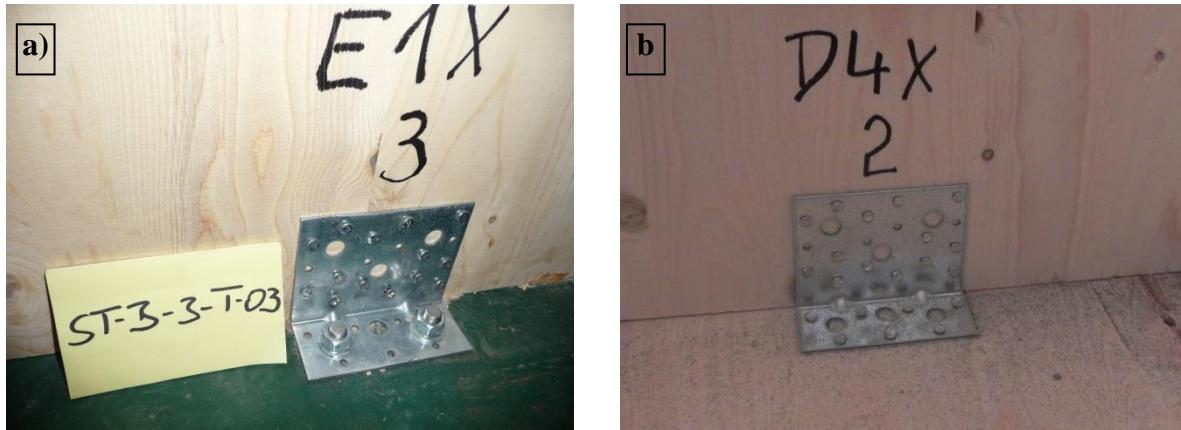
Angle brackets: a) CLT – steel frame; b) CLT – CLT
